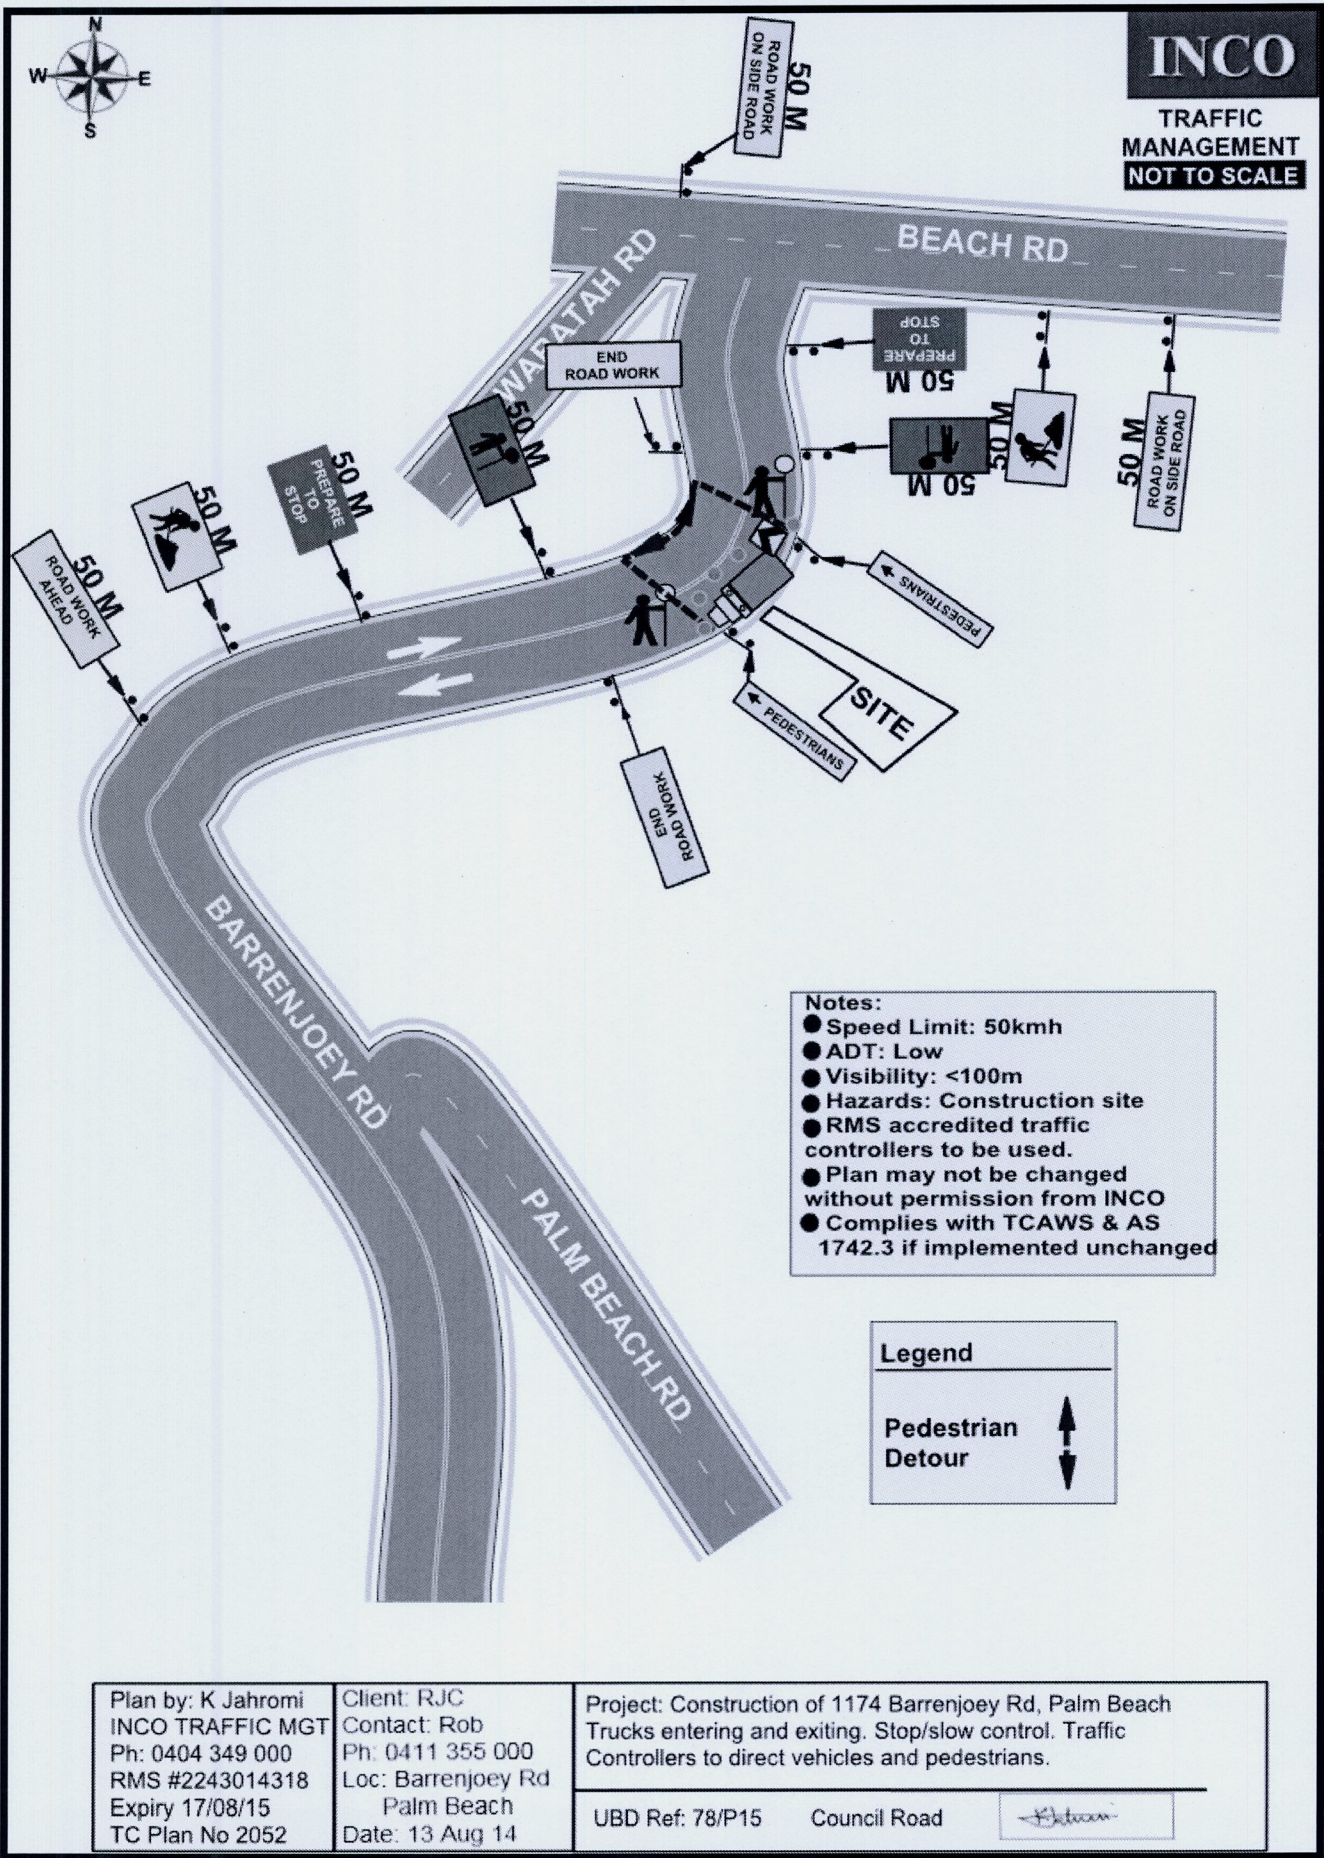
TRAFFIC CONTROL PLAN - STAND PLANT
